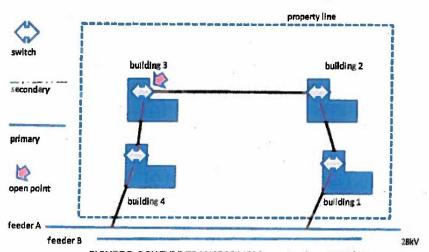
DRY TYPE TRANSFORMERS greater than 1,000kVA
